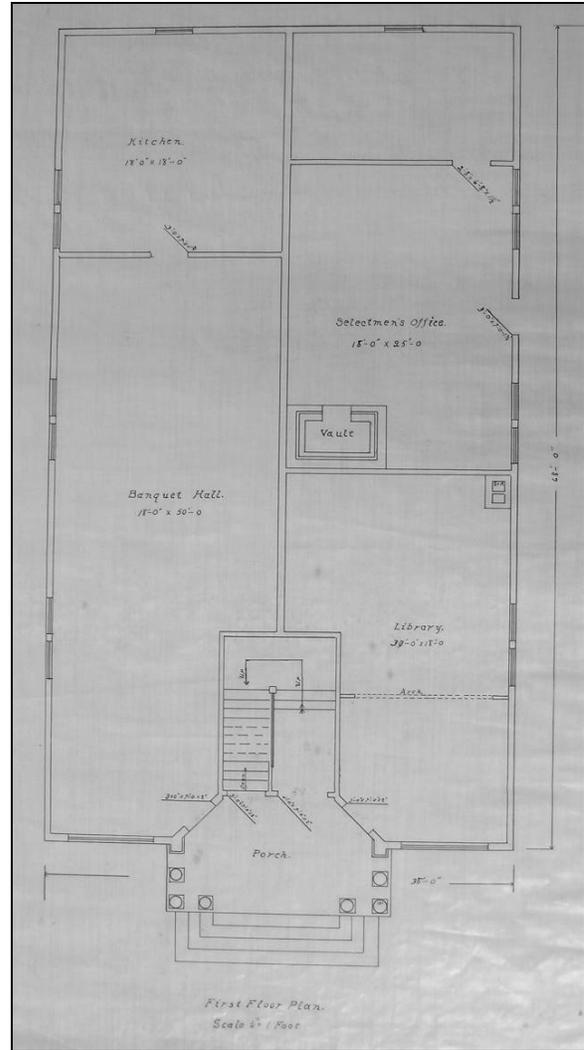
First-floor plan, Bath Town Hall, 1909-1910, as built. Collection of New Hampshire Historical Society.
